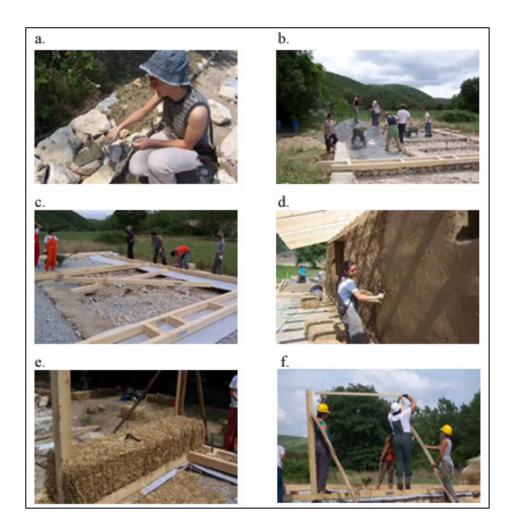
Application of straw bale, a. the basic construction of stone, b. preparation of the basic top frame, c. basic surface water insulation, d. plaster over straw, e. straw bale placement, f. gaps in doors and windows [42]
